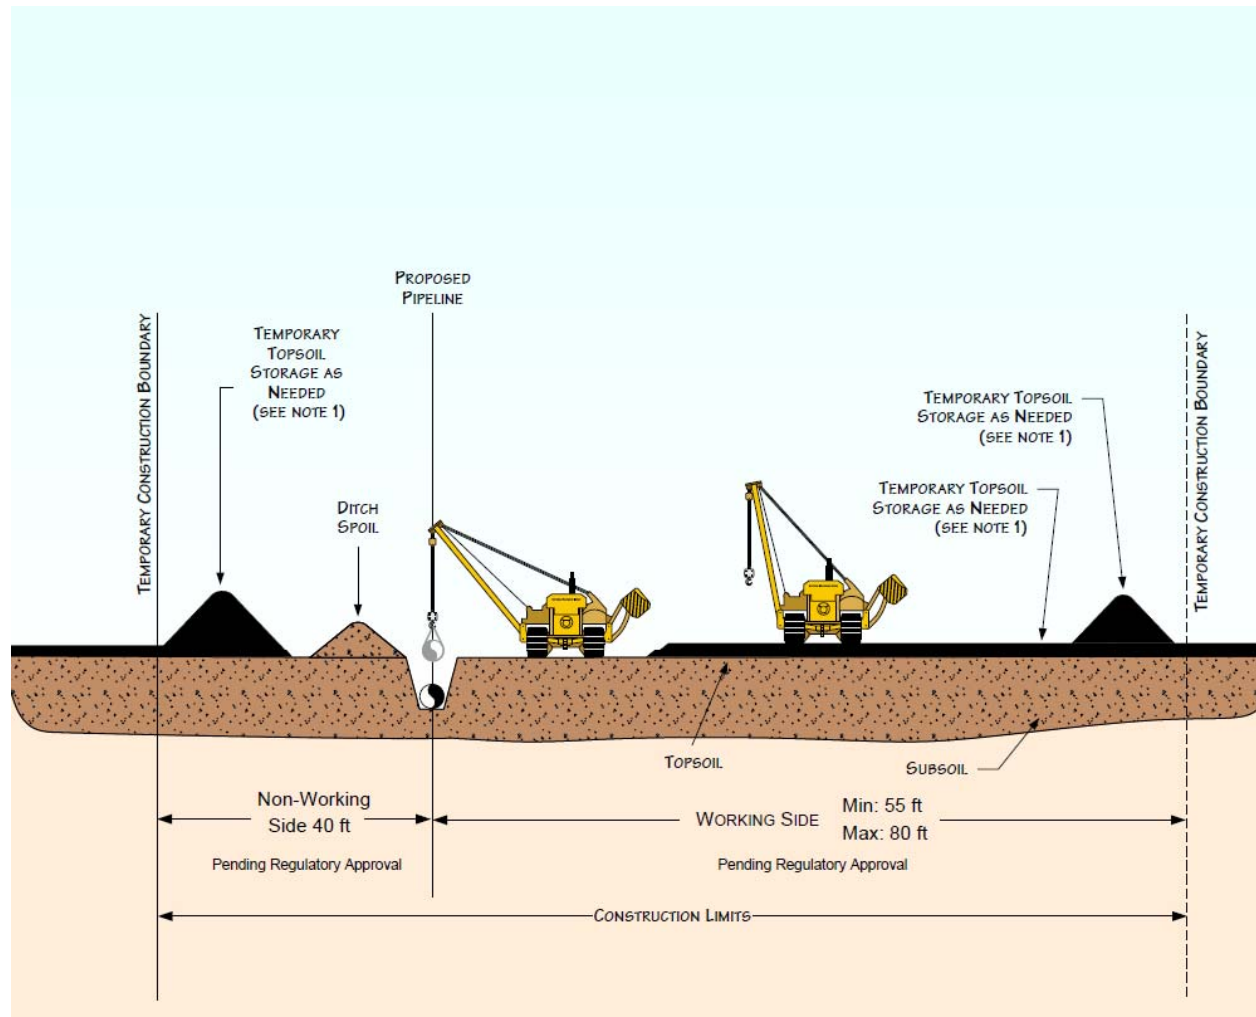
Typical Topsoil Segregation – Modified Ditch Plus Spoil Side
